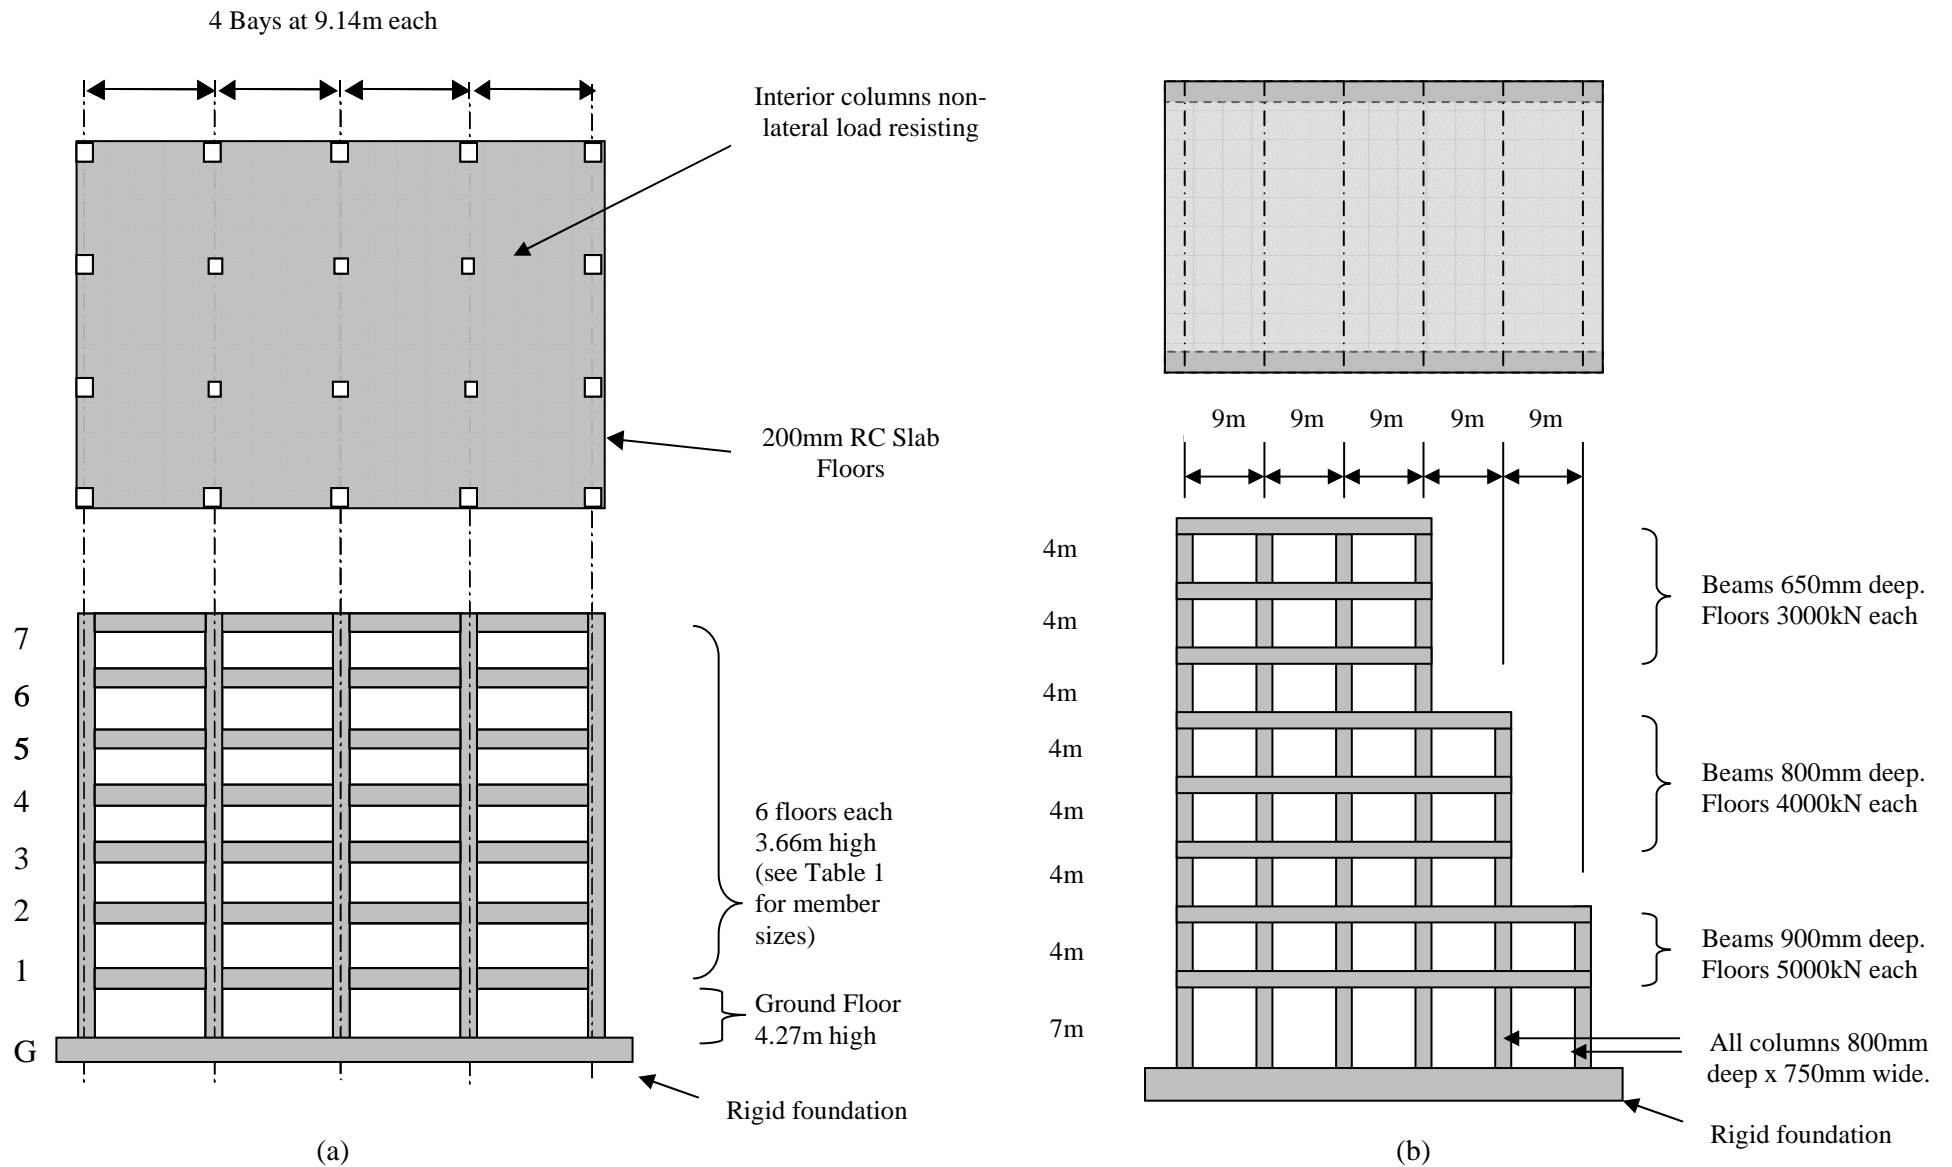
Details in plan (top) and elevation (bottom) of (a) Case Study 4 - Regular moment frame structure and (b) Case Study 5 - Vertically Irregular moment frame
